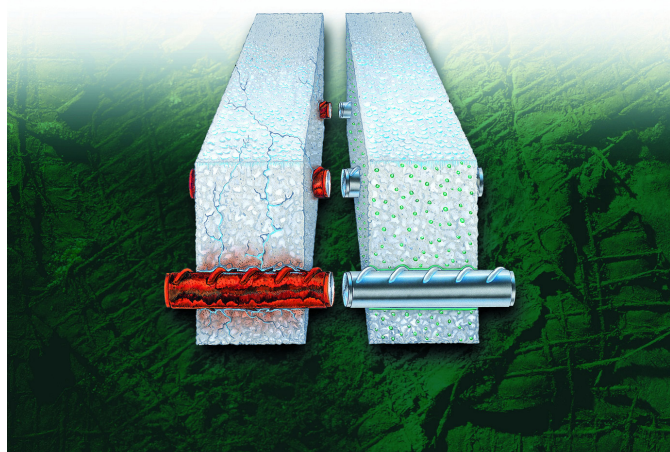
Illustration of untreated, corroded rebar (left) and treated, protected rebar (right).
